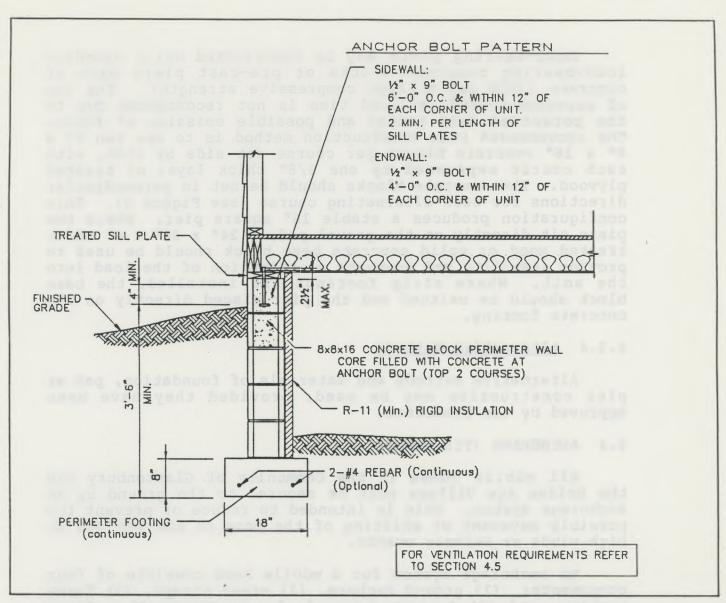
STANDARD DETAIL FOR PERIMETER BEARING WALL ON FOOTING (REQUIRED FOR HOMES WITHOUT STEEL FRAME OUTRIGGERS AND CROSS-MEMBERS)
